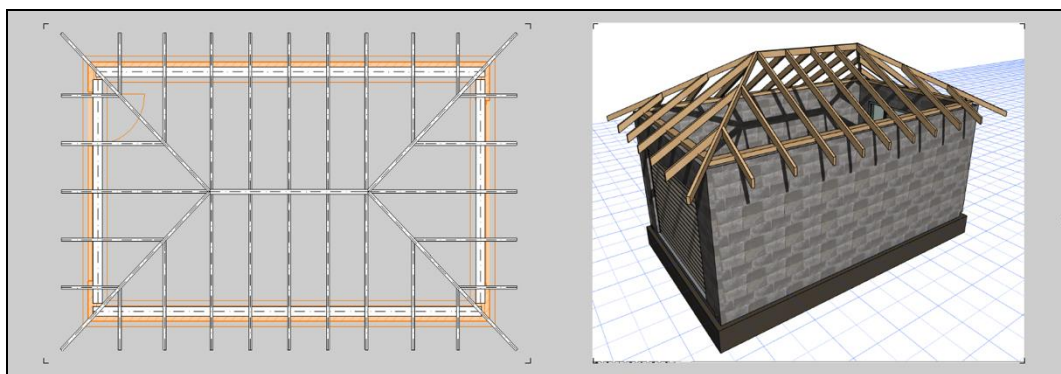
Preliminary design sketches of a Garage-project; a traditional roof structure layout and a model in perspective projection (Created by: F. Acs)
